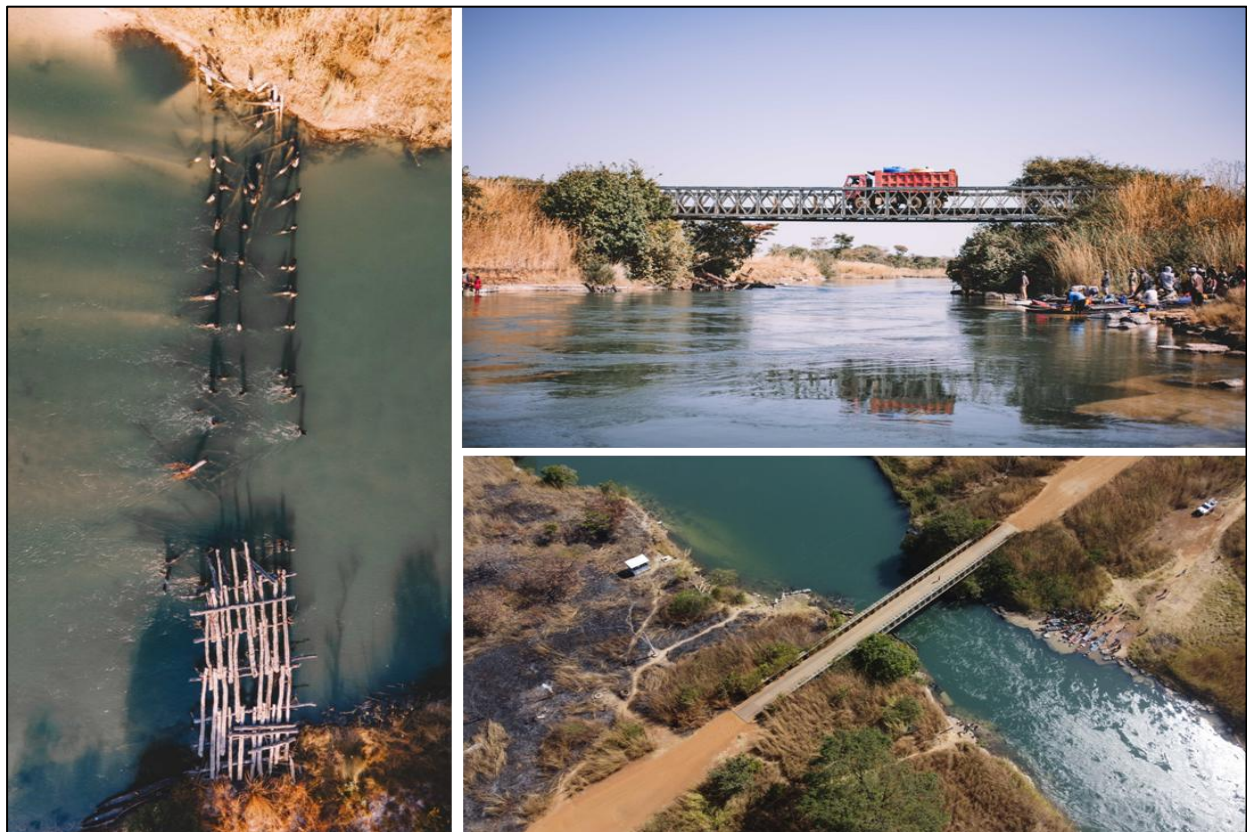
An inactive bridge (left) and the EN180 road bridge shown from different angles.
